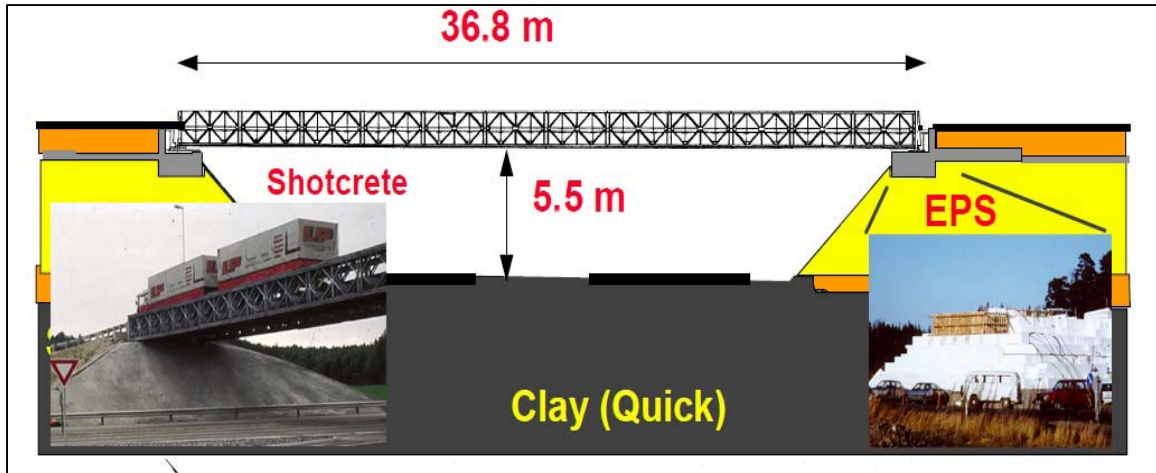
Single-lane, single-span, steel bridge structure supported on EPS block at Lokkeberg, Norway (Aabøe and Frydenlund, 2011).
